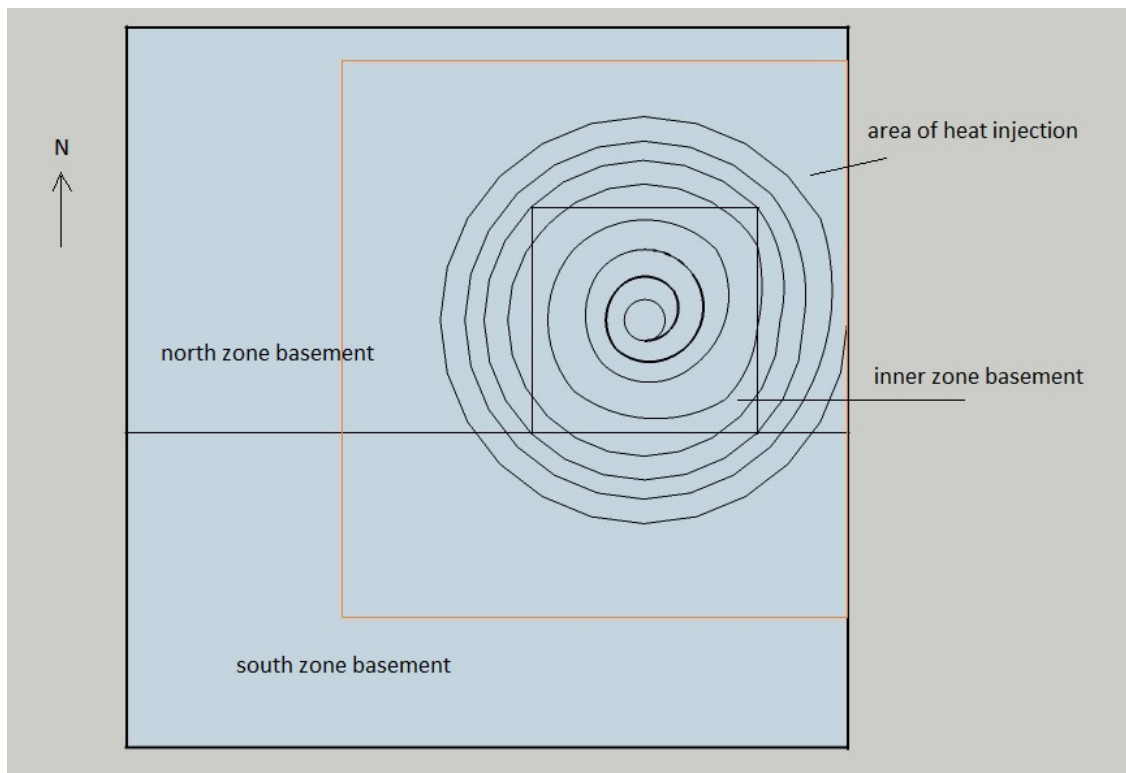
Alternative 3: Heat injection in both inner and outer zones of the basement floor
